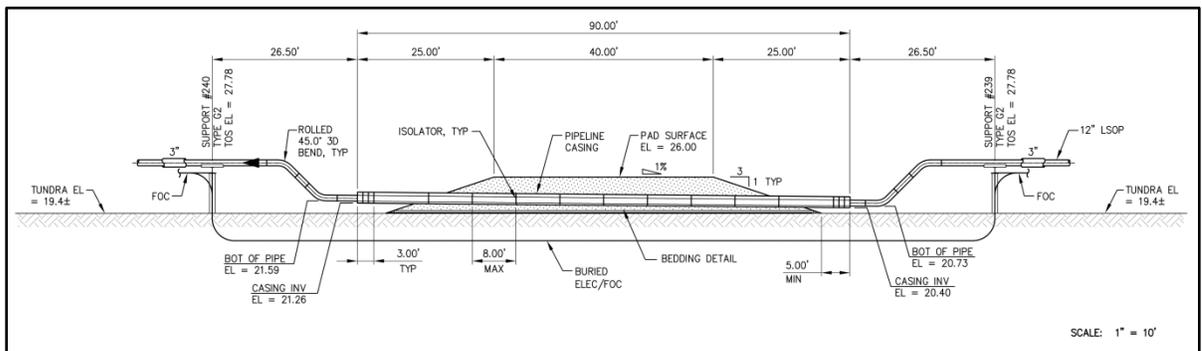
Badami Ice Road Crossing Pad, Section View
